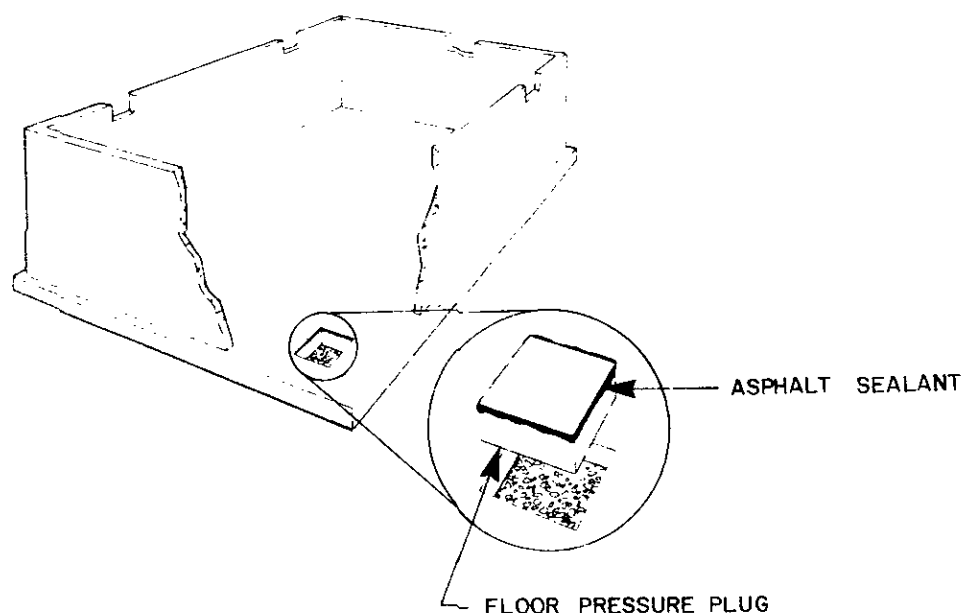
Basement floor blow-out plug. (Reference 9)
